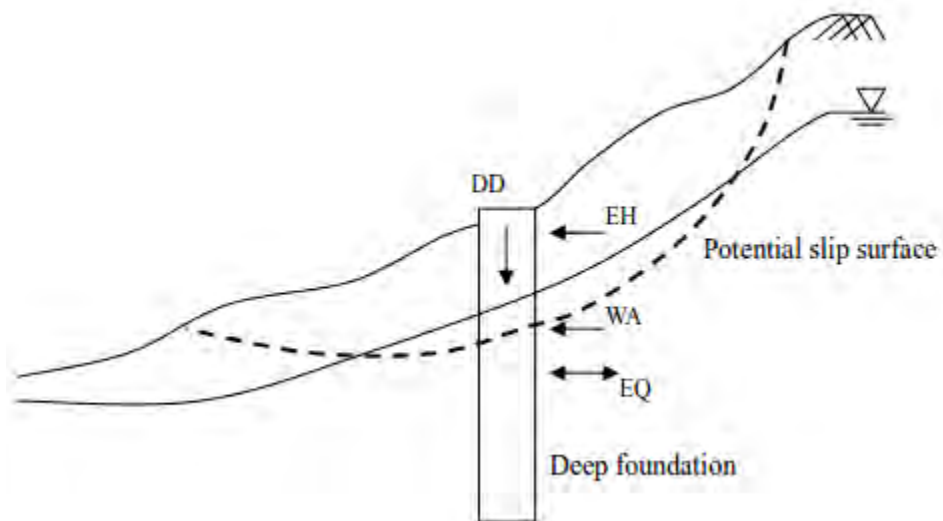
Typical loads in deep foundations for slope stabilization.
